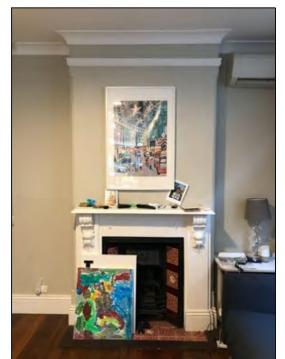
The fireplace with timber mantlepiece in the living room. Note the later plasterboard ceiling and cornice.
